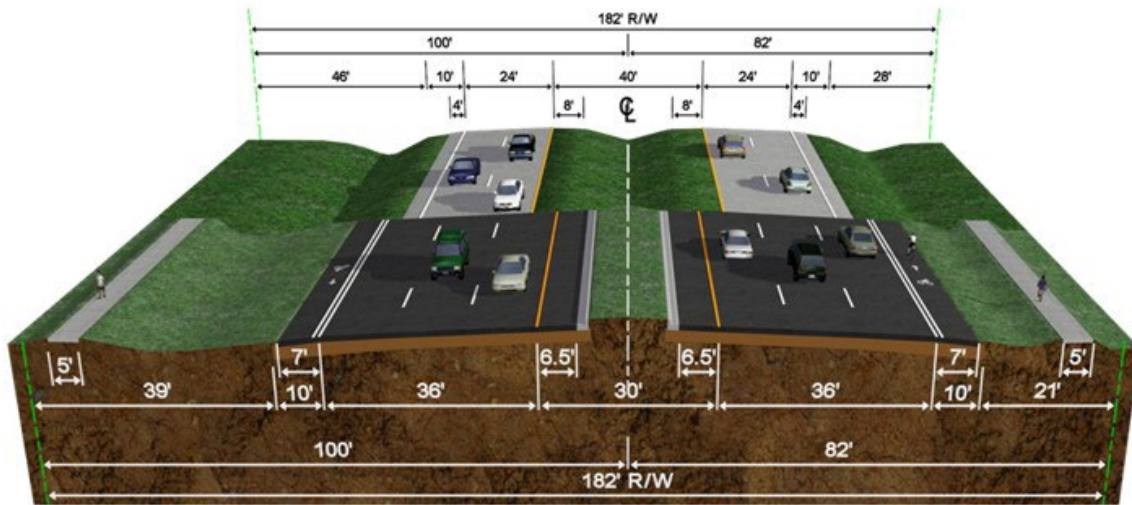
| Proposed US 41 Roadway Typical Section - Kracker Avenue to Palm Avenue
